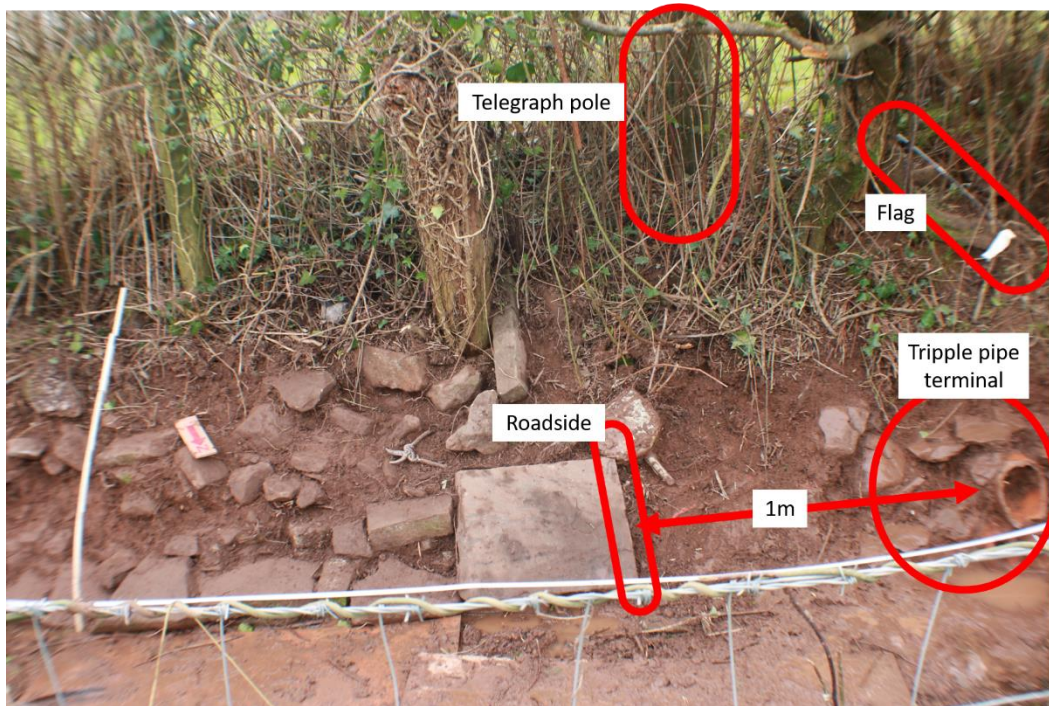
Road alignment showing position relative to the telegraph pole marker and triple pipe terminal.
